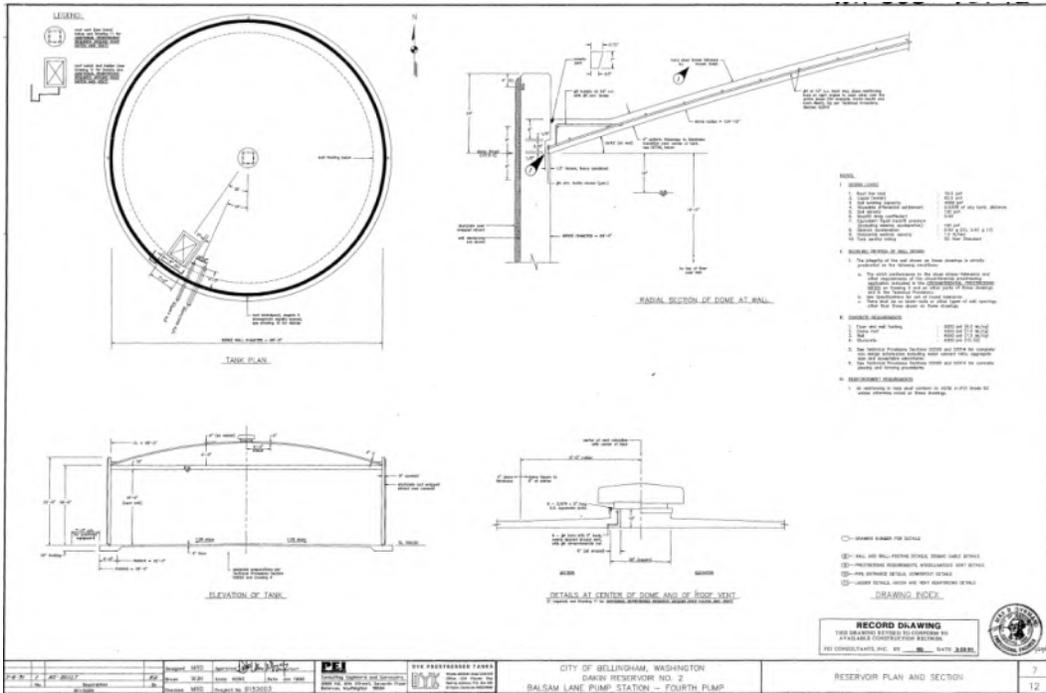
Dakin 2 – Reservoir Plan and Section, Sheet 7
